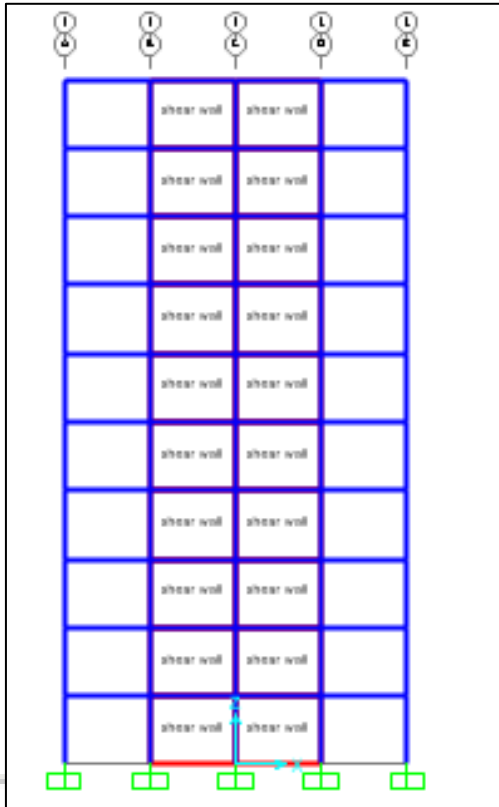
elevation plane of 2d 10 storey building structure with shear wall
